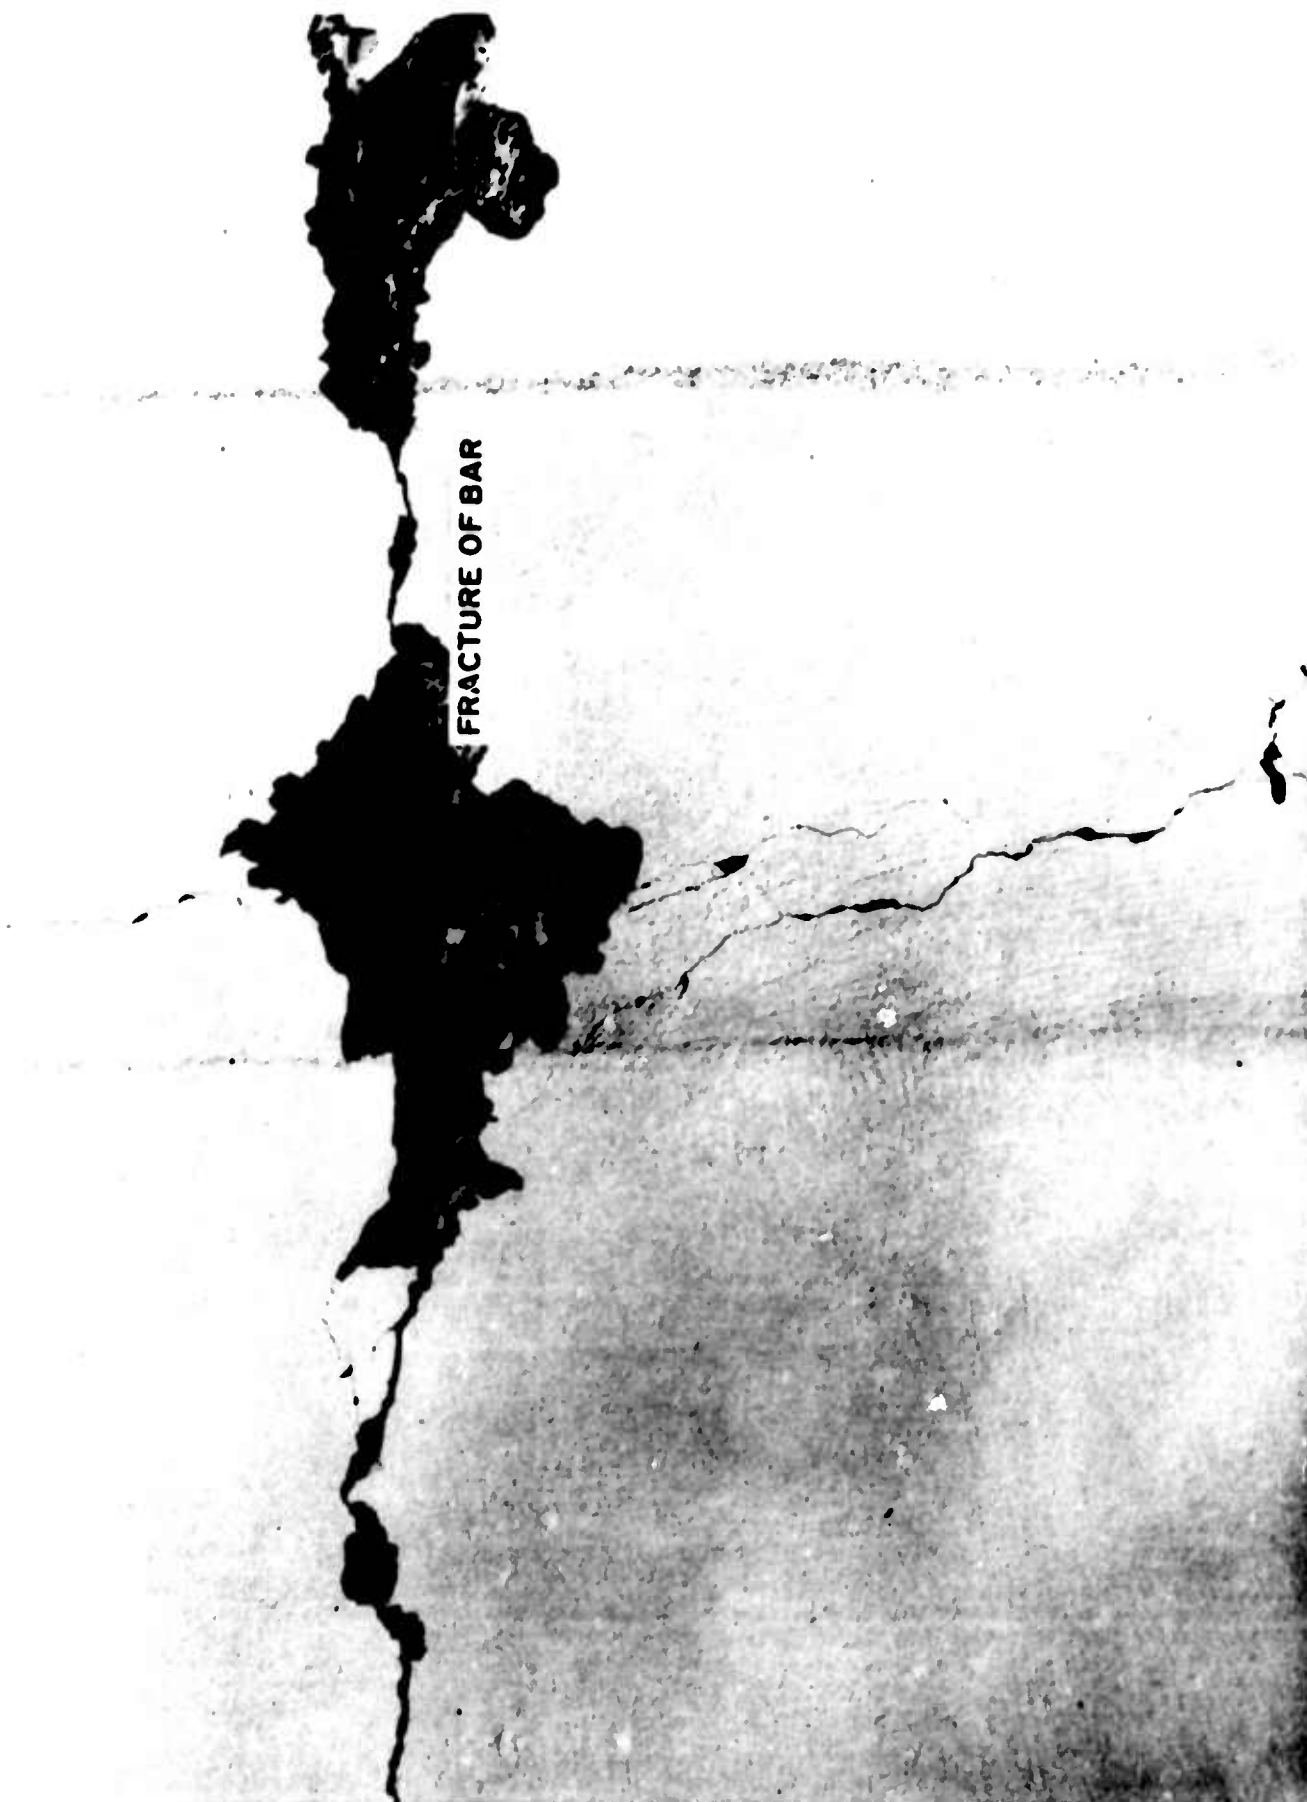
Elmendorf AFB Aircraft Control Tower (Closeup of horizontal crack following reinforcing in south wall. Notice buckled and fractured vertical bar.)
